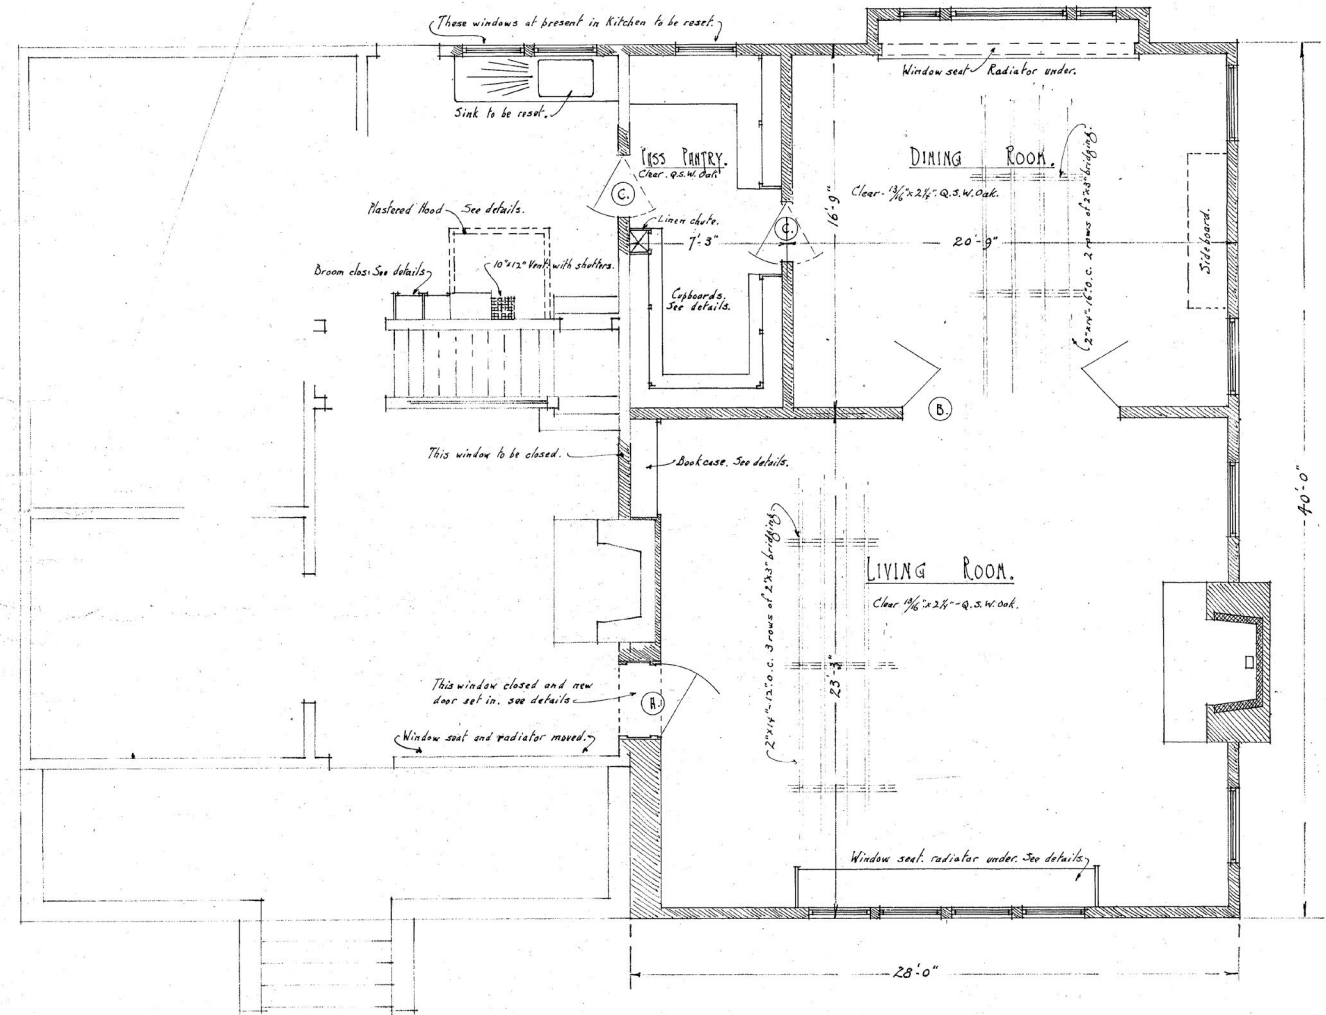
1922 First Floor Plan construction drawing, showing the original house (shaded, left) and the north addition, right. Room name annotations have been added to clarify old and new space uses. (Courtesy Tim Wahl collection, citations available, with shading and room name clarifications by SHKS Architects.)
